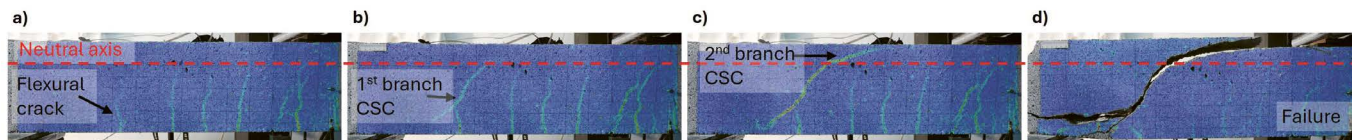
Crack pattern evolution in a RC beam, without stirrups, failing on shear.
